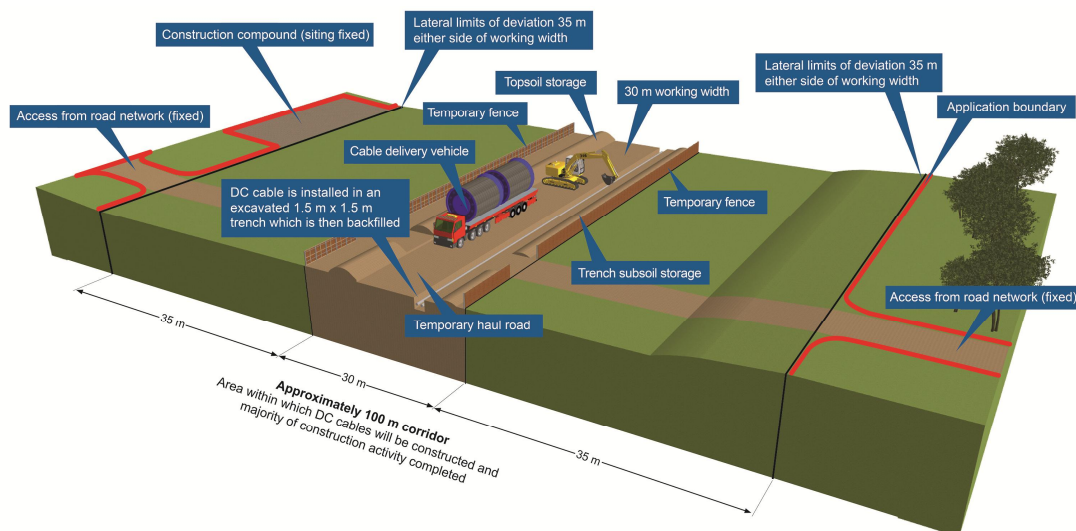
Typical Cross-Section of the DC Cable Route Corridor
